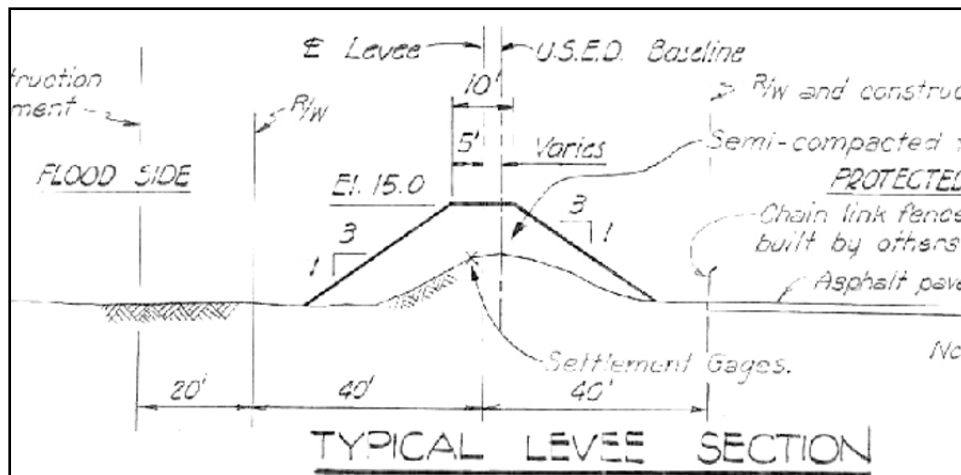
Levee Section Between IHNC and France Rd Ramp Shows Elevation 15 ft on Top of Existing Levee
